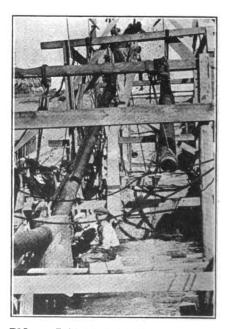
THE DRIP POCKET WELDED INTO THE PIPE LINE
